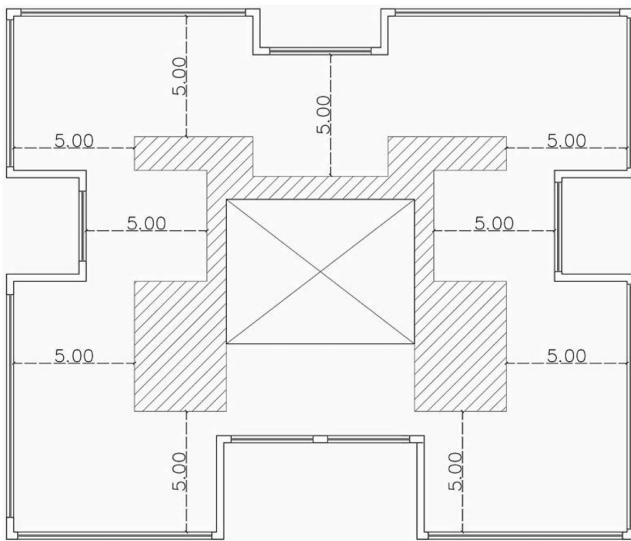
Office and residential typical floor plan layout with the requirement set in SI 5282 Energy Rating of Buildings for 5 m depth of windows to usable floor space.
